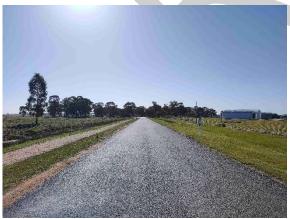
Looking north along Burma Road, with the site on the left hand side
